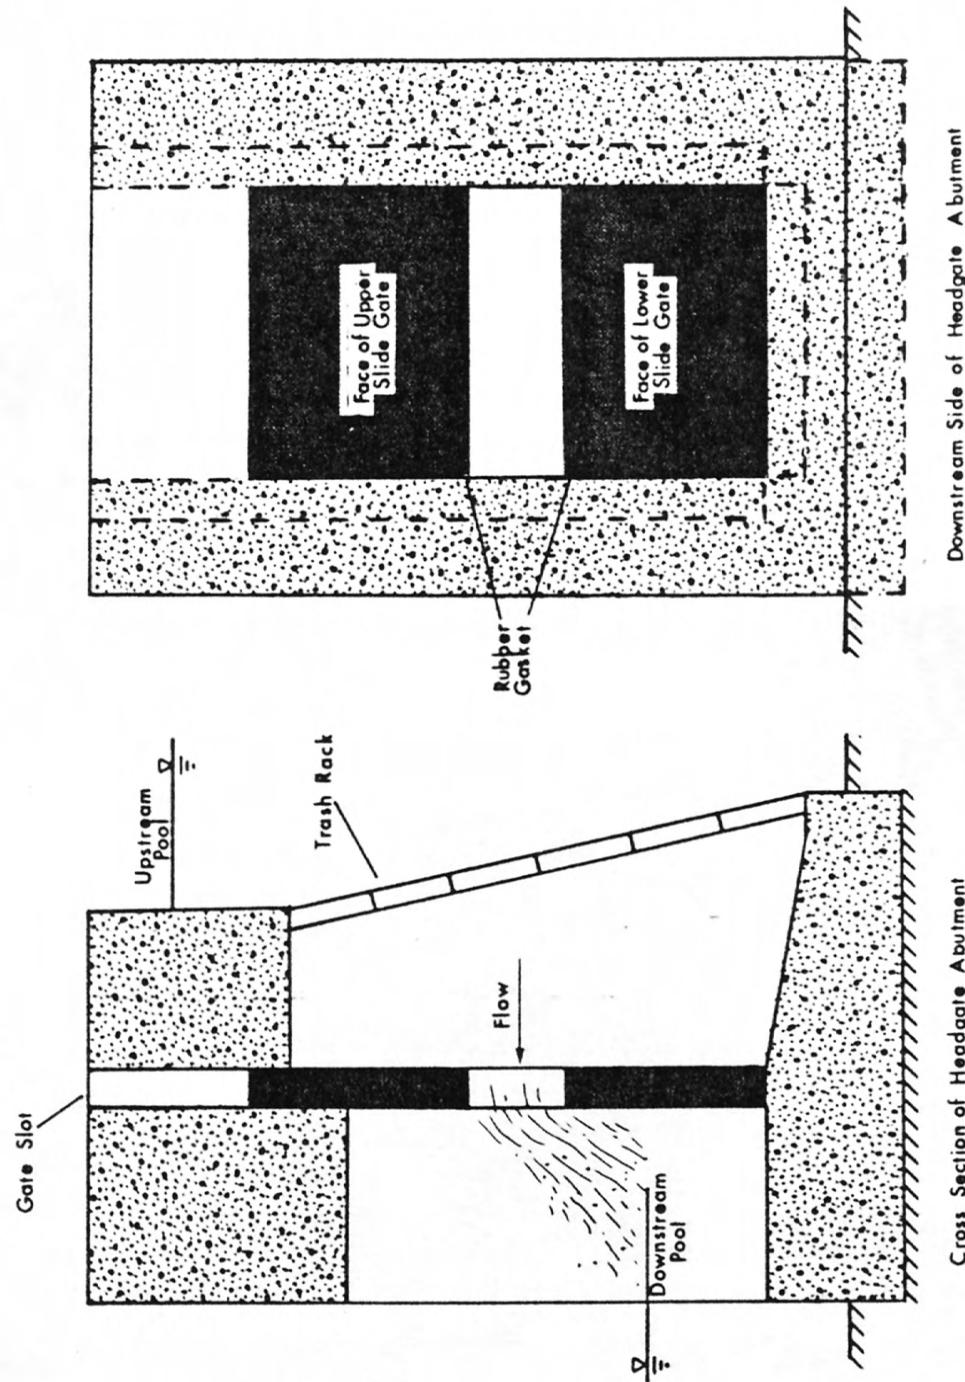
Diagrams showing construction of a typical headgate abutment.
